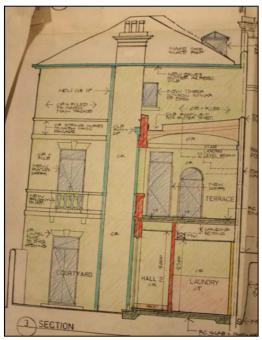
Section indicating the changes to the rear wall of the main wing and works to the rear wing. New rendered finishes and details including string courses were proposed to be carried around with new openings, gutters and downpipes also proposed. The rear wing has new concrete floors with brick walls and a new skillion roof constructed to the earlier rear party wall.
